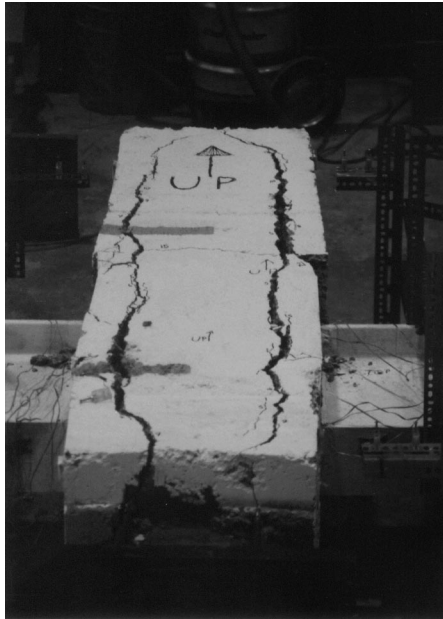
Concrete-encasement damage at end of test of Specimen 1.
